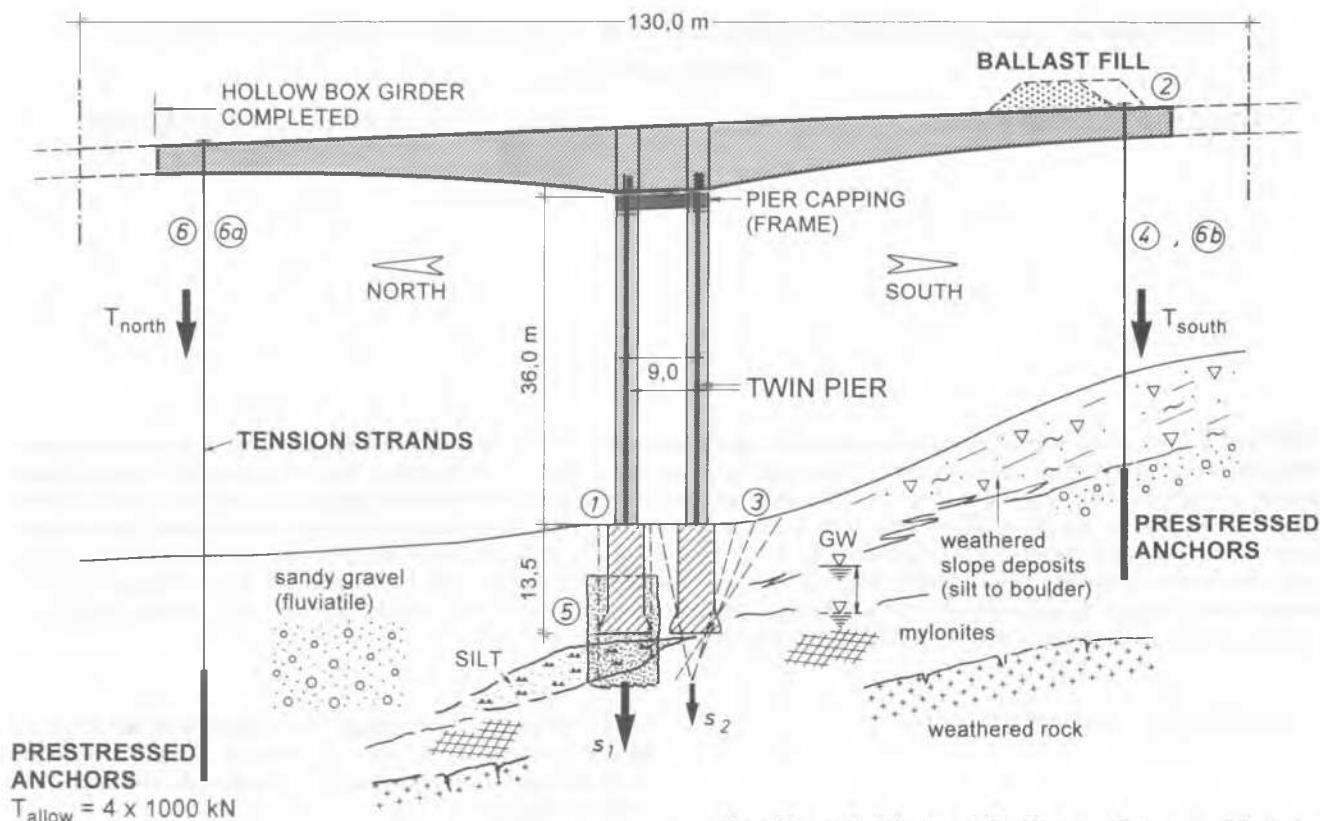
Part of the longitudinal section of a 1.1 km long highway bridge. Differential settlement of the pier foundation (indicated by $s_1 > s_2$), and stabilizing measures:
